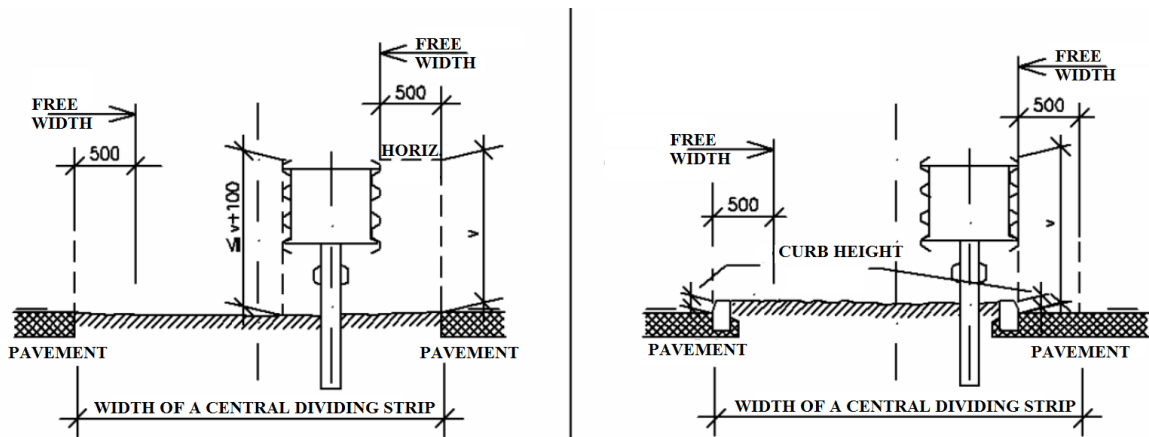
Double-sided crash barrier installation in a central dividing strip [54]
